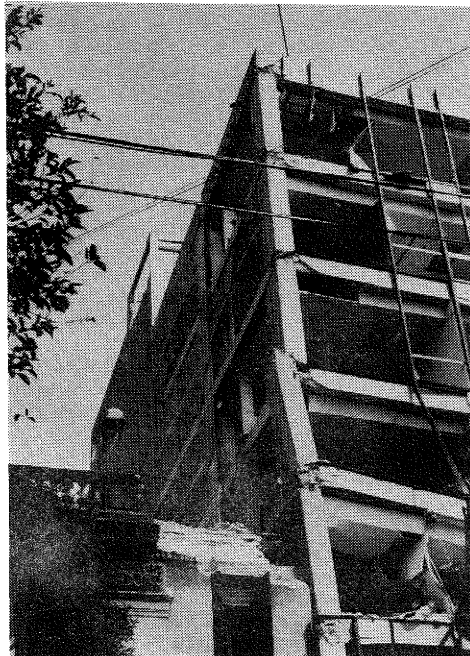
Building on Calle de Tanala which has suffered severe beam/column joint failures.
